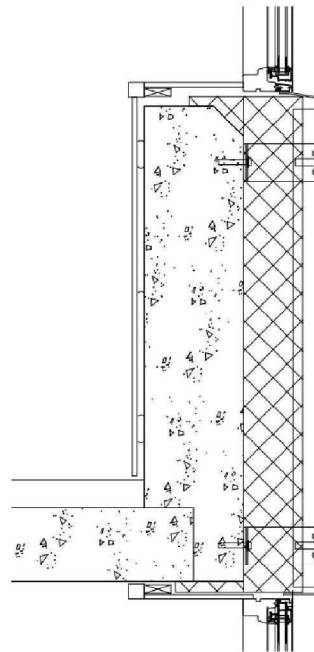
Section of Spandrel Wall Panel with New Insulation and Rain Screen Cladding
